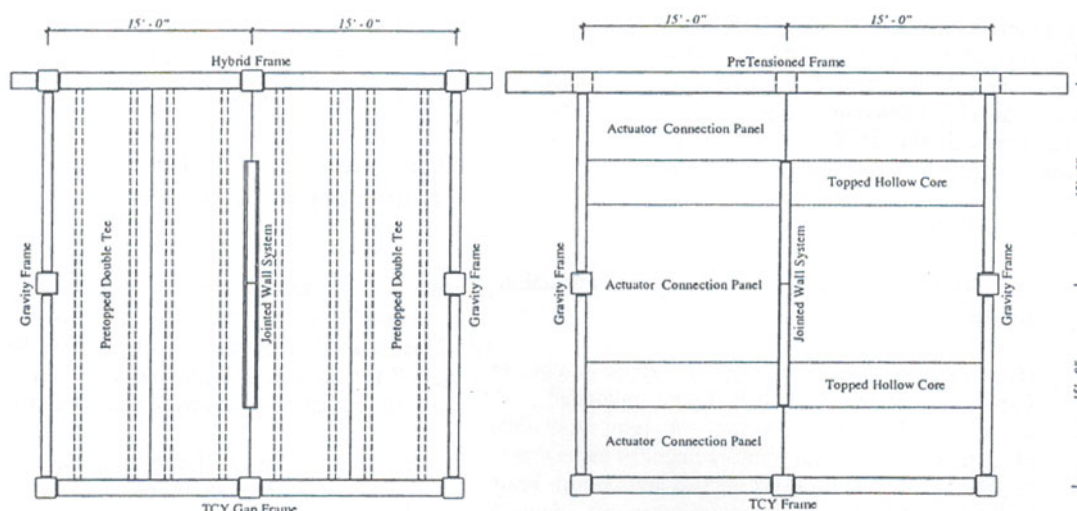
Floor plan view of the test building at Levels 1 to 3 (left) and levels 4 and 5 (right)
